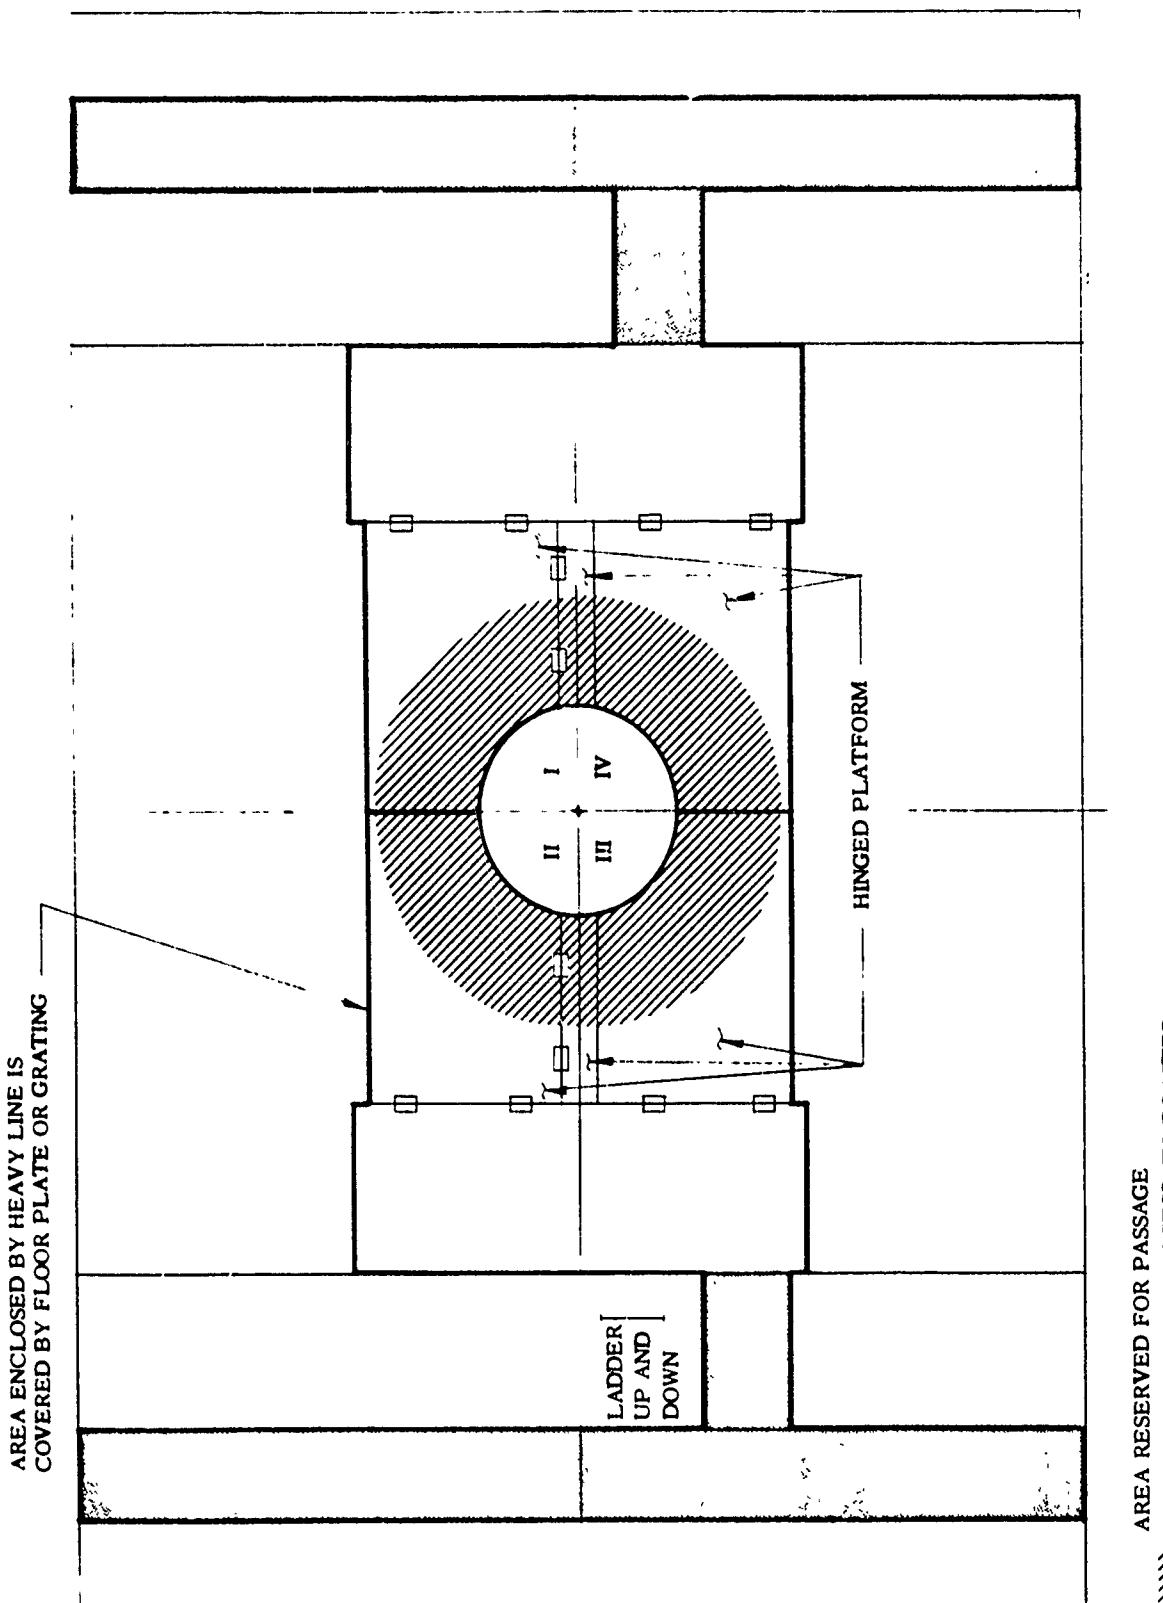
Usable Floor Space Areas, Tower Station 93
